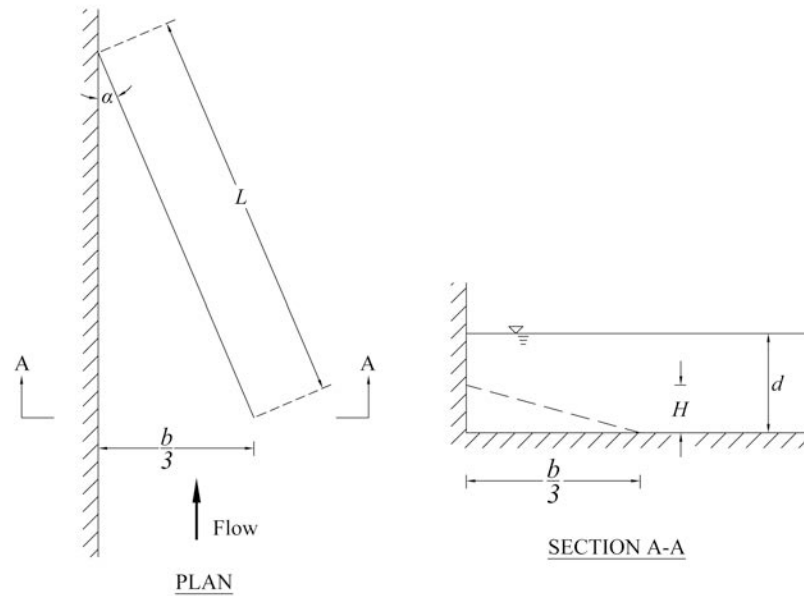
Backwater study plan and elevation diagram spur ( $H=d/2 = 4$ -inches shown). Structures are angled at 27 degrees into the direction of flow.
